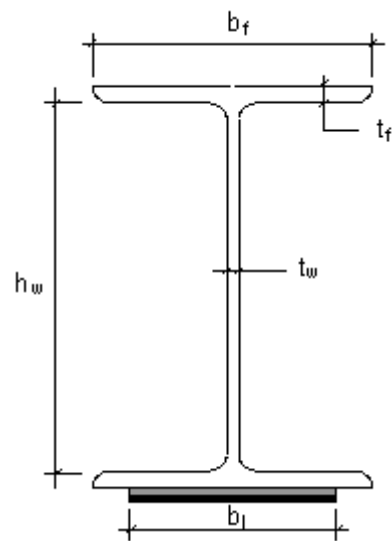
Cross-section of steel beam strengthened with bonded prestressed laminate
